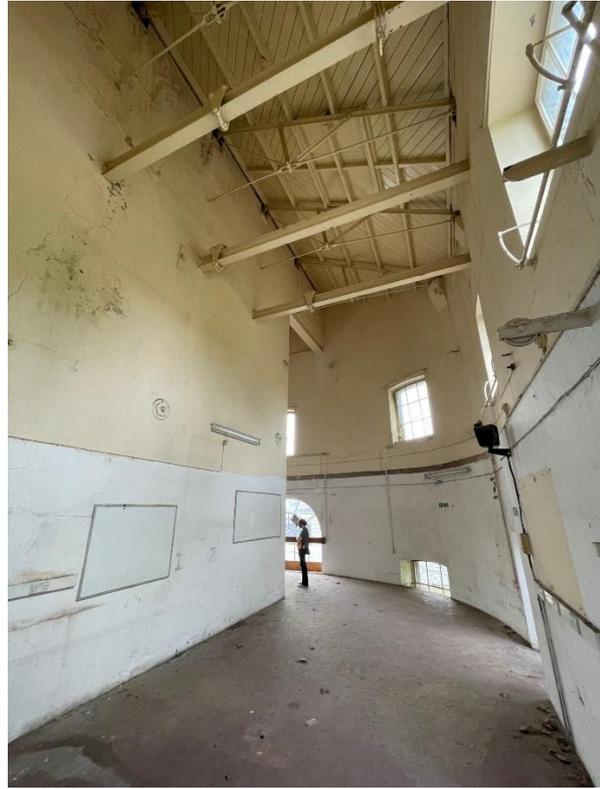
Photograph of North Stores, Engine House and Pump House (west)
